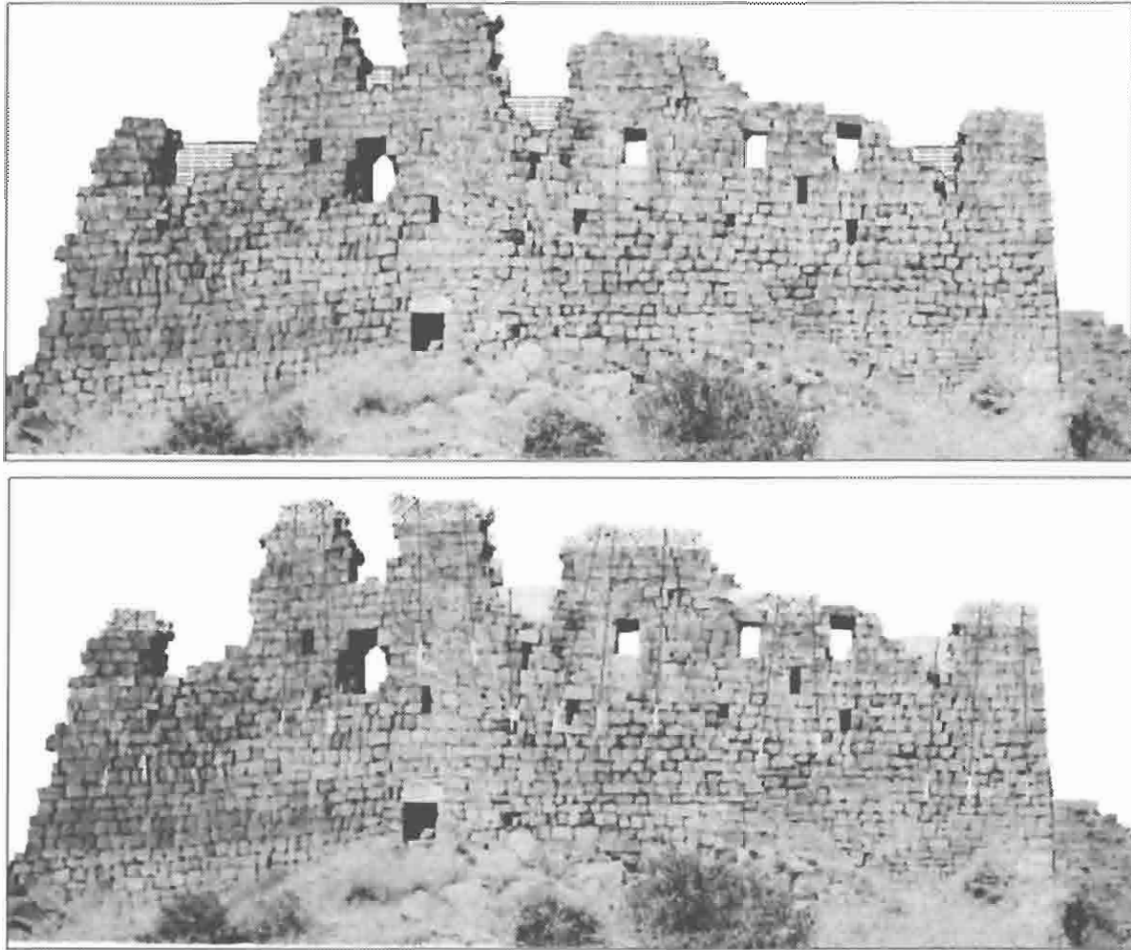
Scheme of south east wall interventions: edges reinforcement of the masonry ridge caps, integrations, steel bars consolidations.
